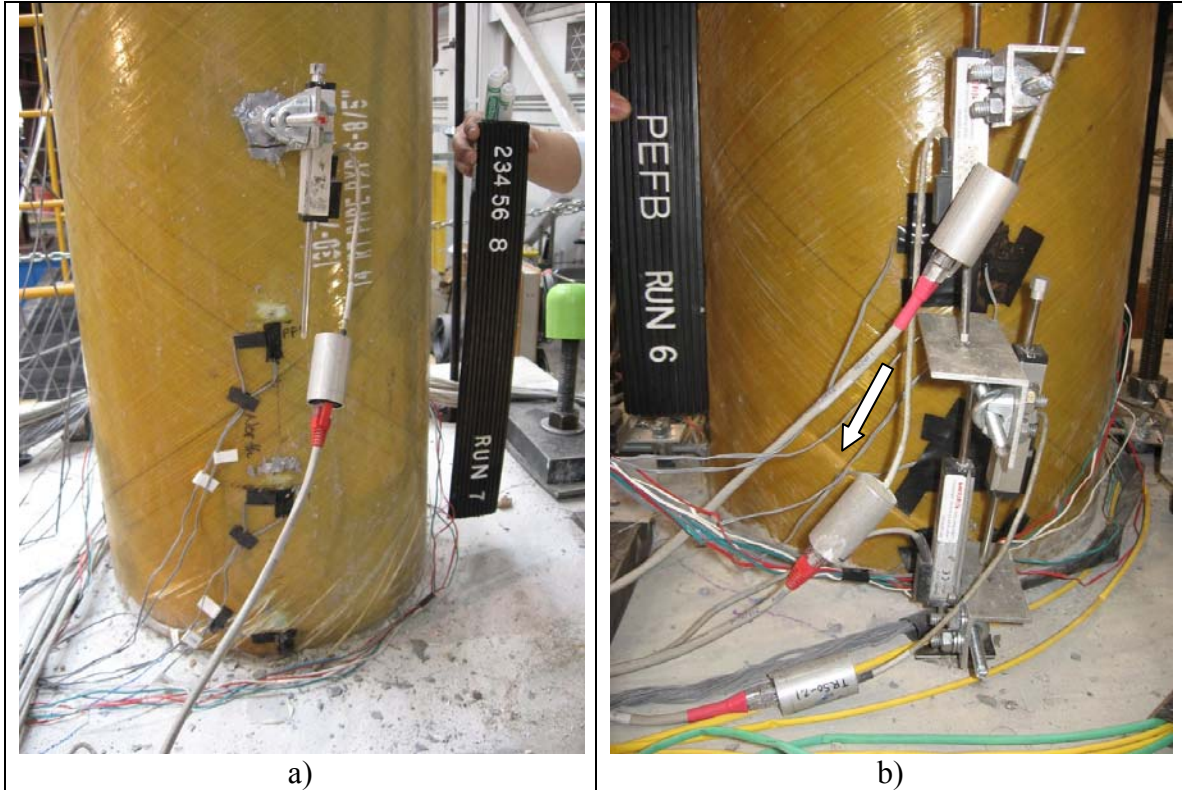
Apparent Damage at Failure Point in FRP Columns, North a) PPTC (CIS) [Zaghi and Saiidi, 2010a], b)PEFB (Precast)
